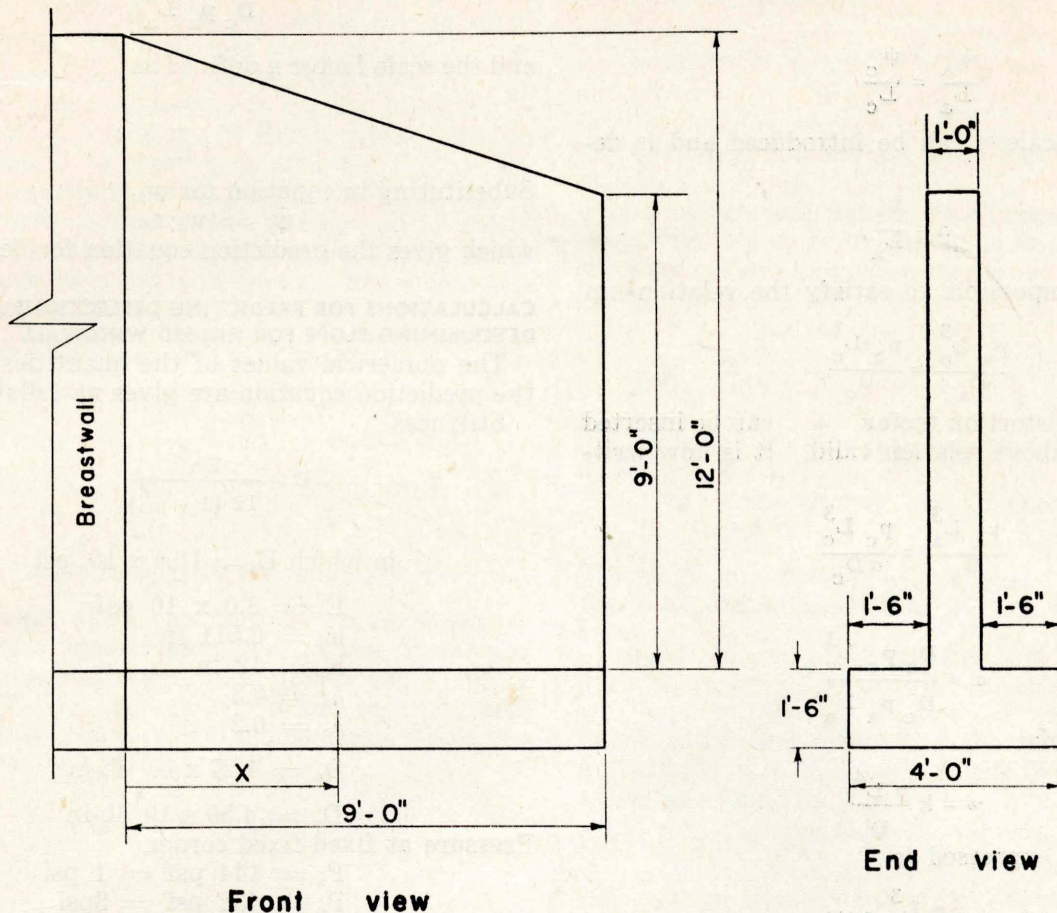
Concrete wingwall for slope and footing rotation analysis.
